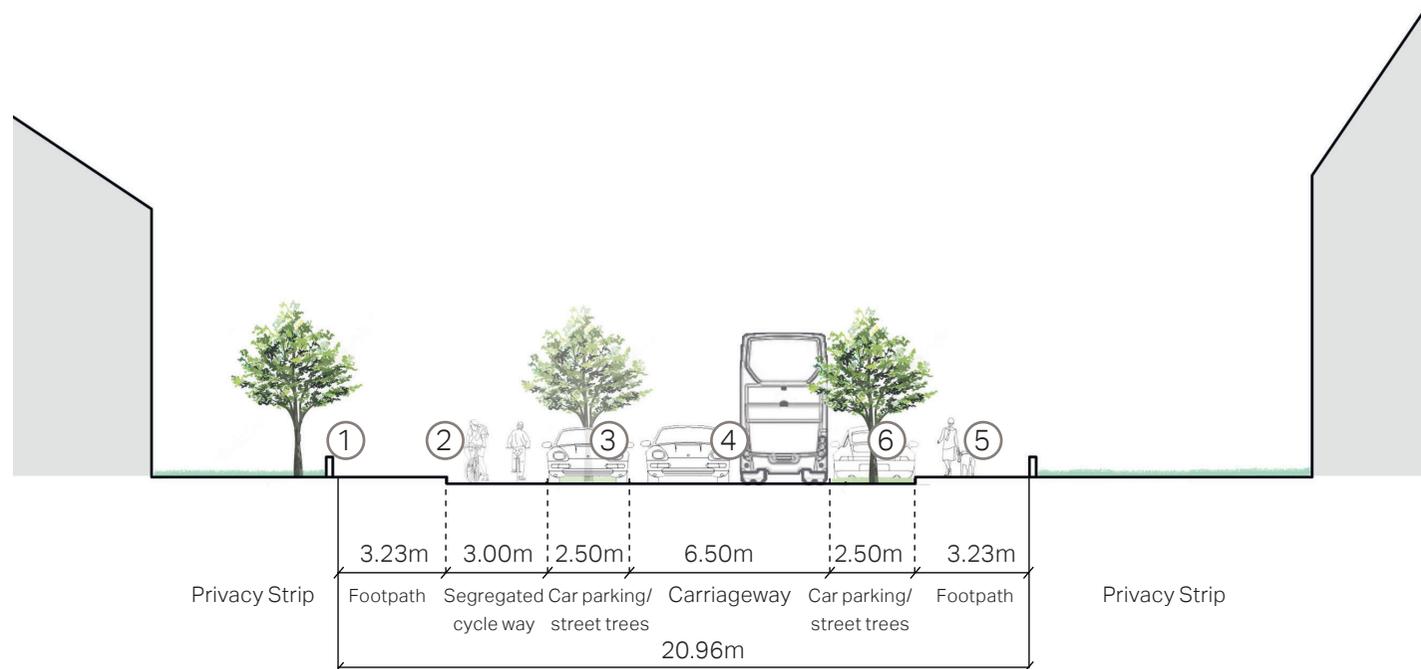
Cross-section illustrating example dimensions Barrack Road.
